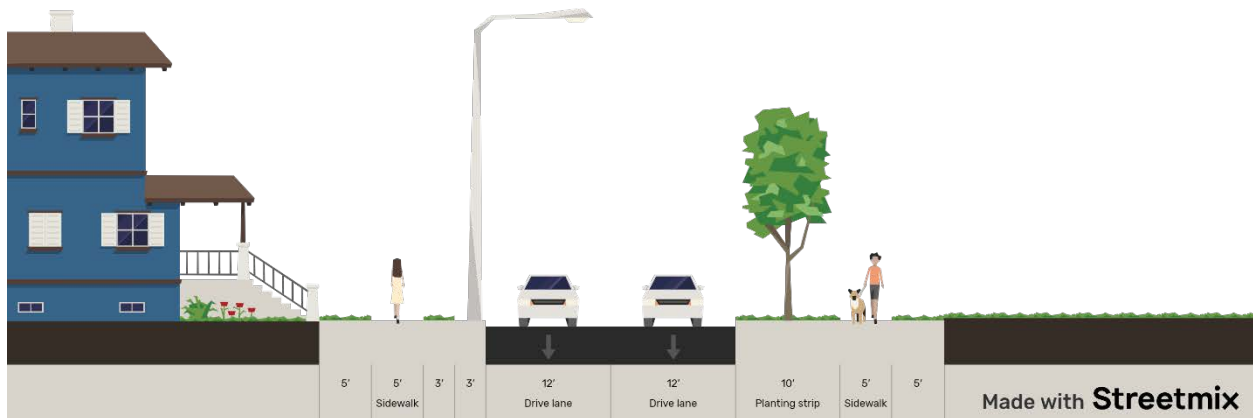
Street cross-section of E Waldburg Street. The park is to the right of the street which has two drive lanes and wide sidewalks on either side of the street along with planting strips as separators. Diagram created in Streetmix by EC, 2022.
